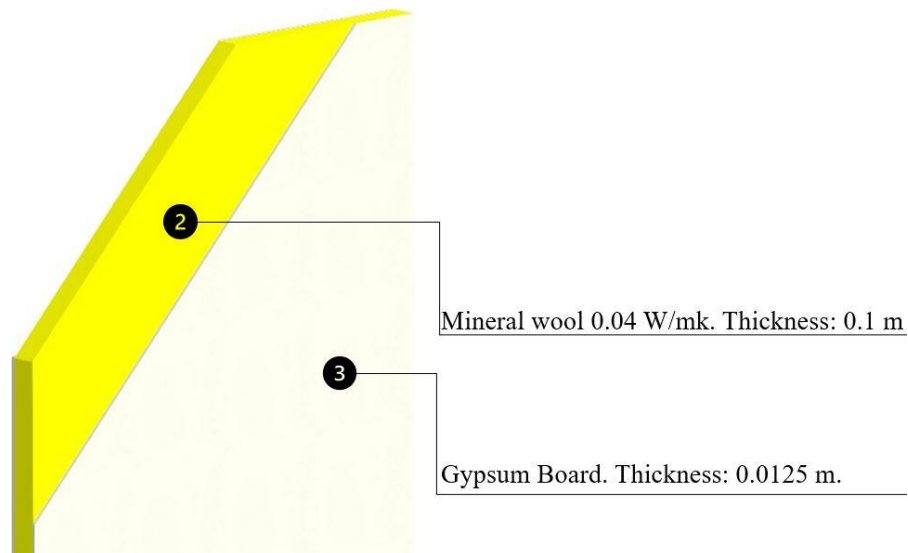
Wall of the shaft opening towards the corridor Byggforsk 524.233 Interior walls with steel posts.
